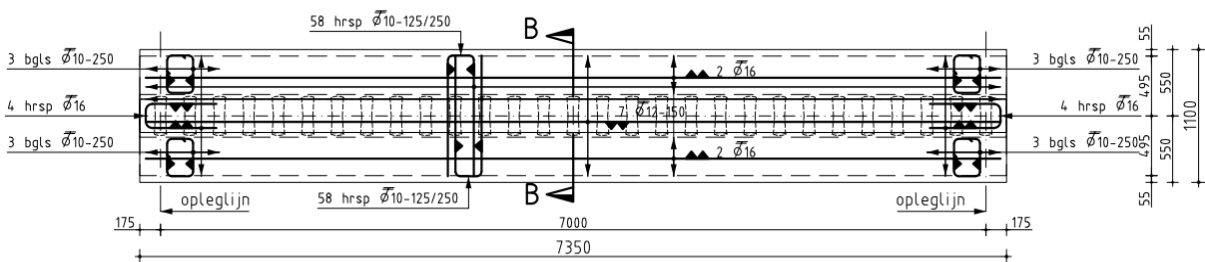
Shear reinforcement layout of cast in-situ topping
